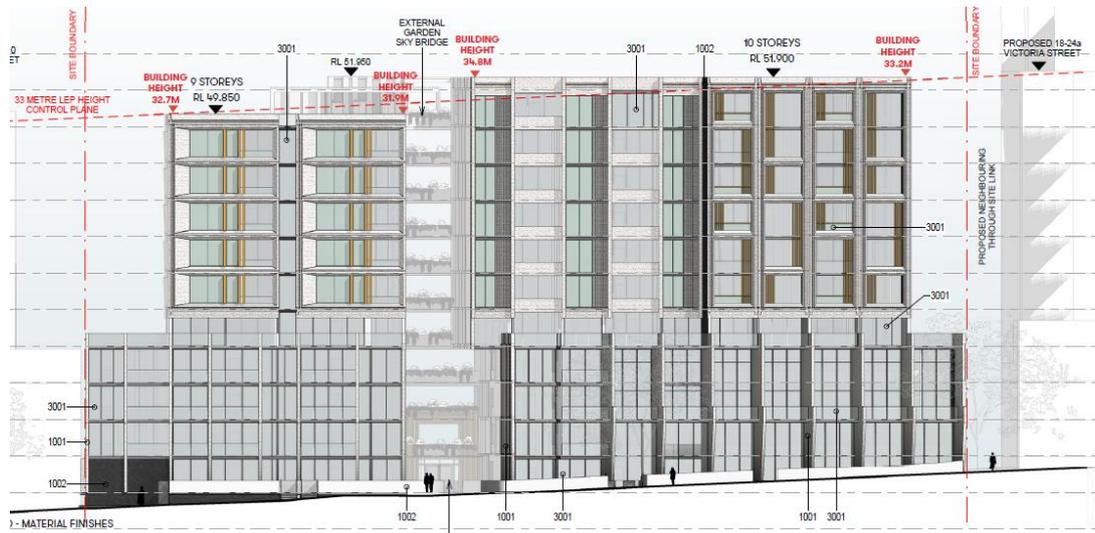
Northern Elevation of the building as it presents to Stanley Street (Source: Scott Carver)
